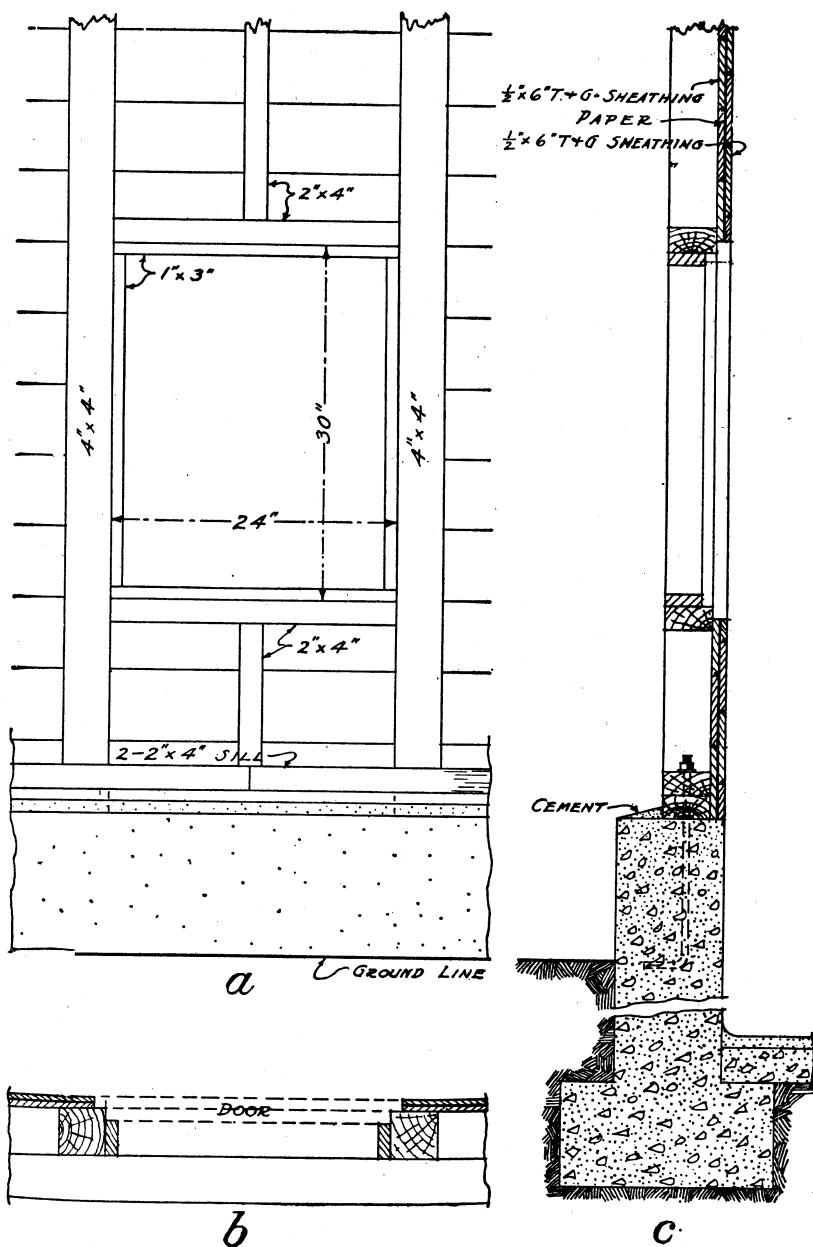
Details of construction of modified Wisconsin silo; a and b, detail of door opening; c, section view of foundation and wall.
